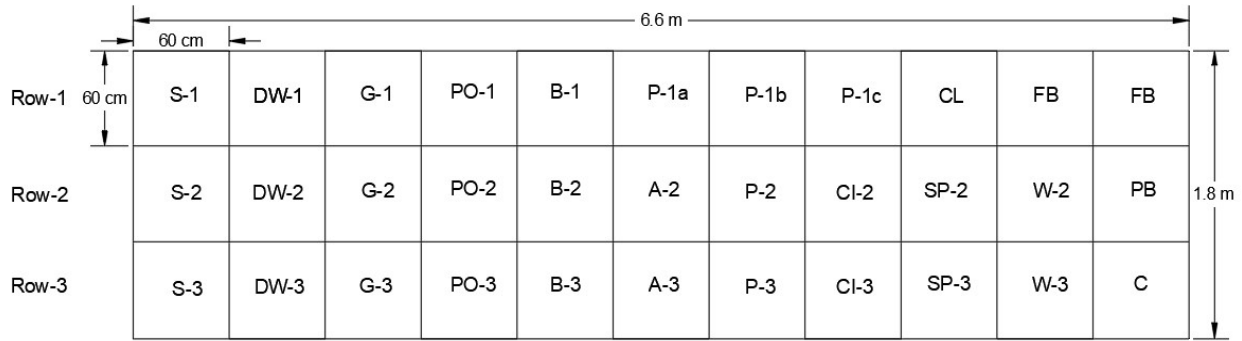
Design of asphalt pavement test section constructed at BITS Pilani- Pilani campus
